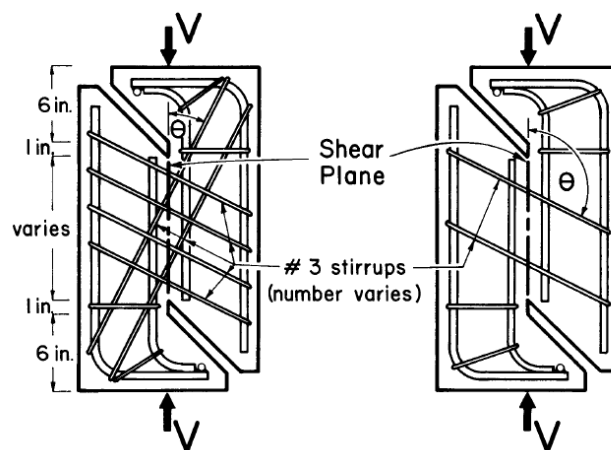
Typical push-off specimens with orthogonal and parallel reinforcement, (Mattock, 1974)
